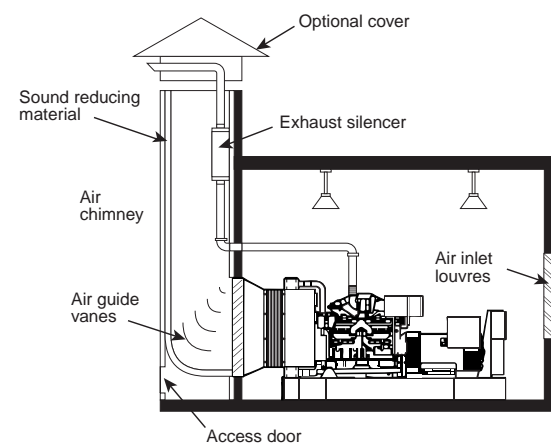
Radiator air discharging into sound-insulated stack containing exhaust silencer.
